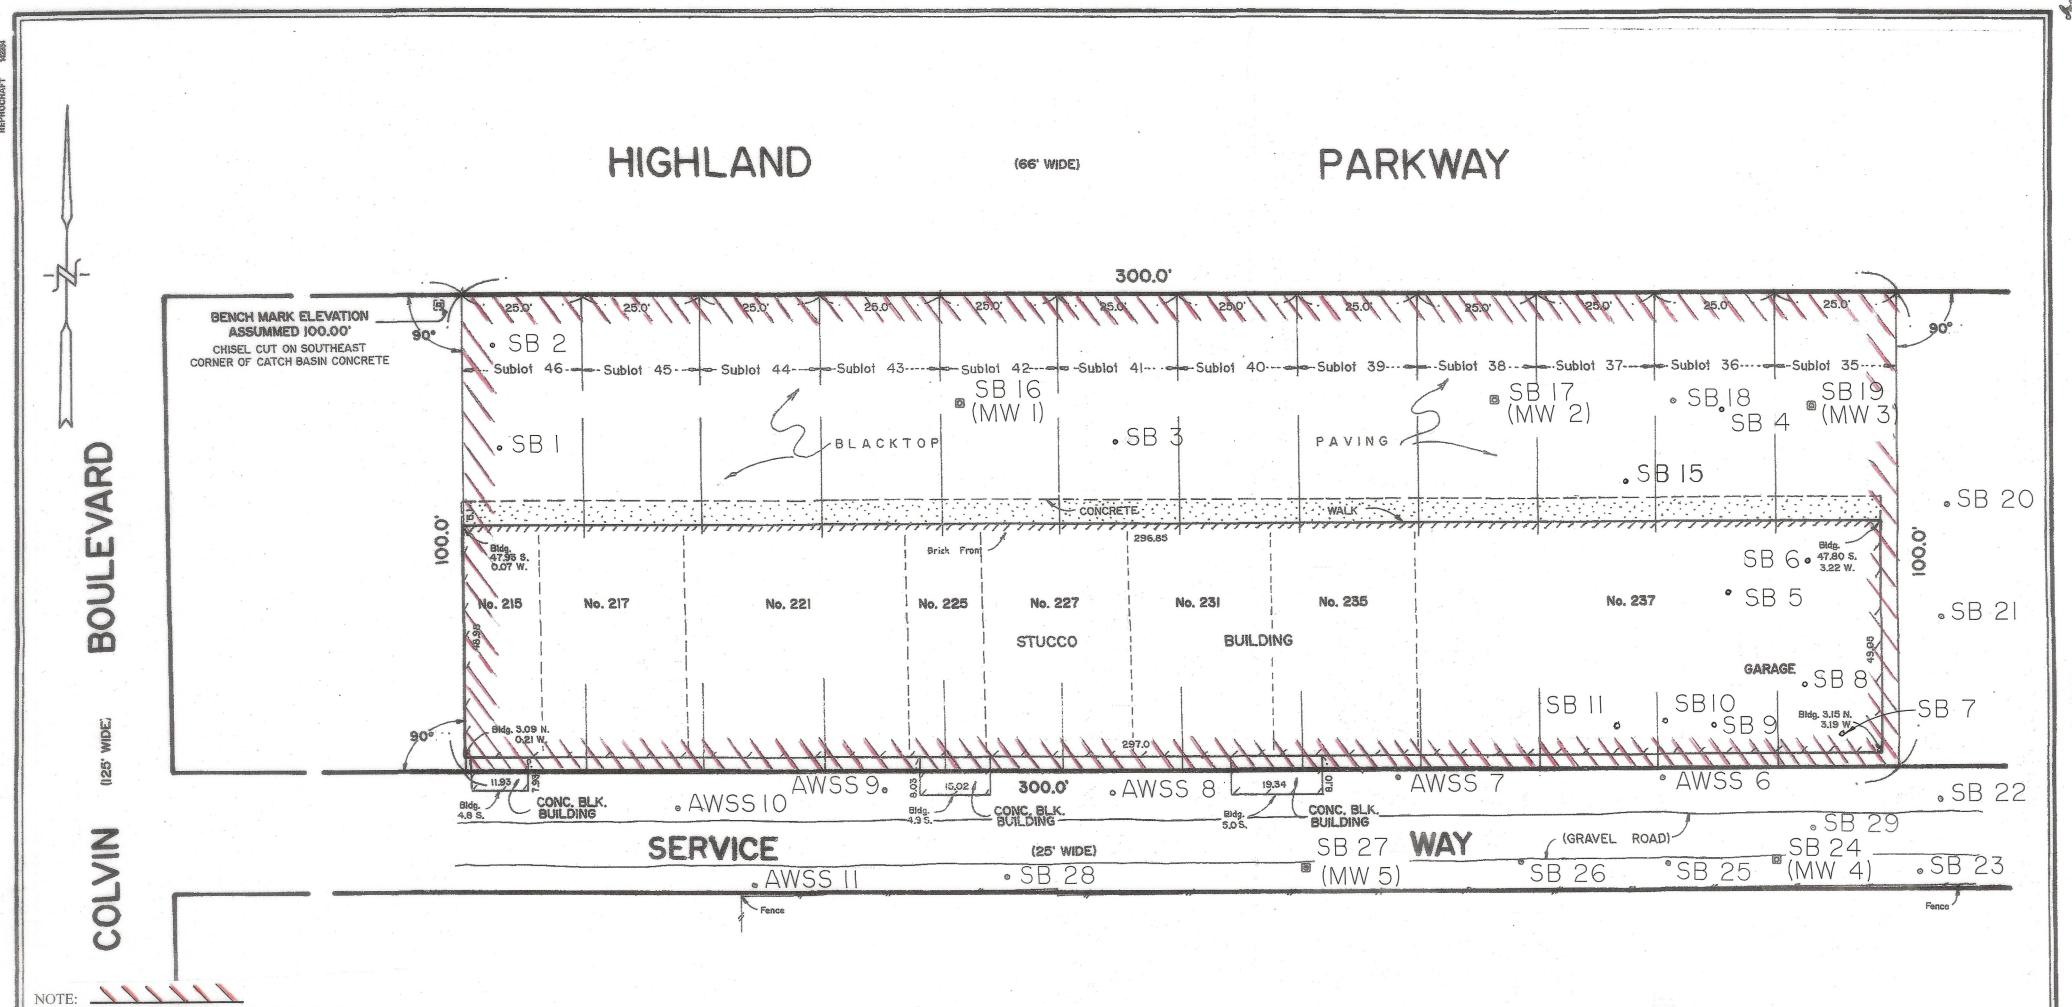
Location of the Highland Plaza BCP Site (Site No. C915293) in Tonawanda, Erie County, New York.
